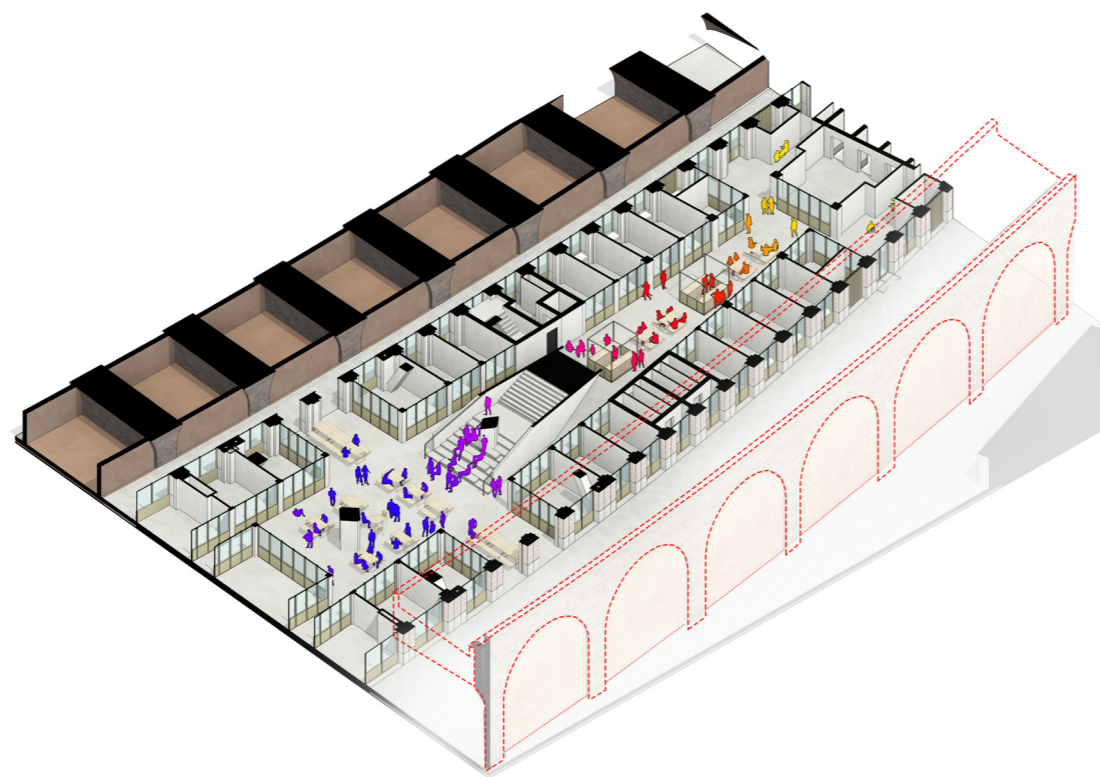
Publicly Accessible Open Space ground floor axonometric diagram
